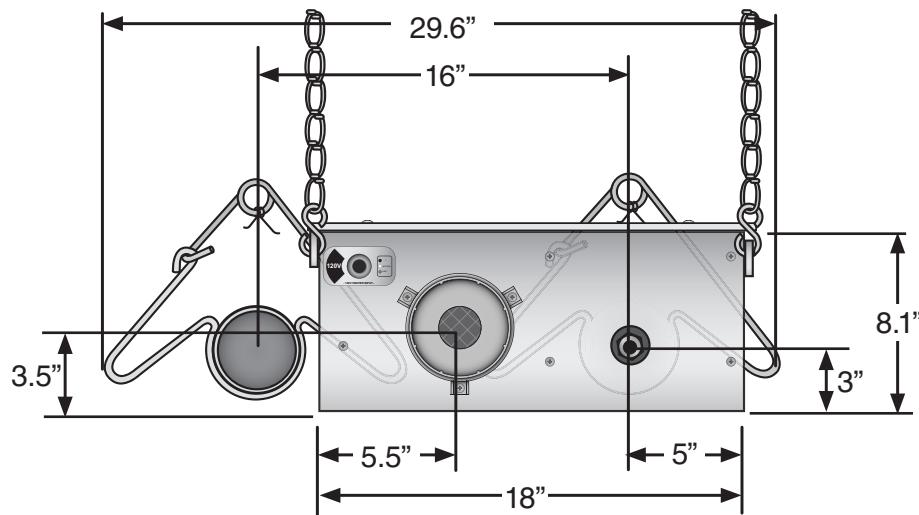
• Burner Control Box showing U-Shaped Configuration • End View
